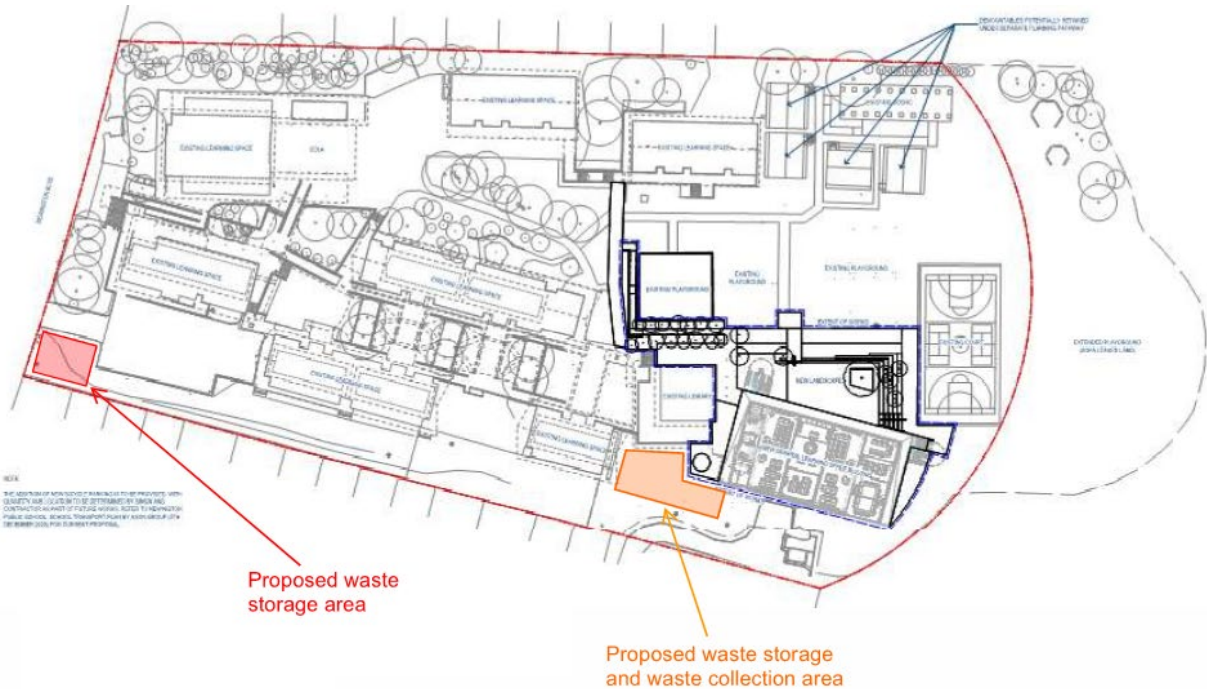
Proposed indicative construction waste storage and collection location (Source: MRA Consulting Group)
